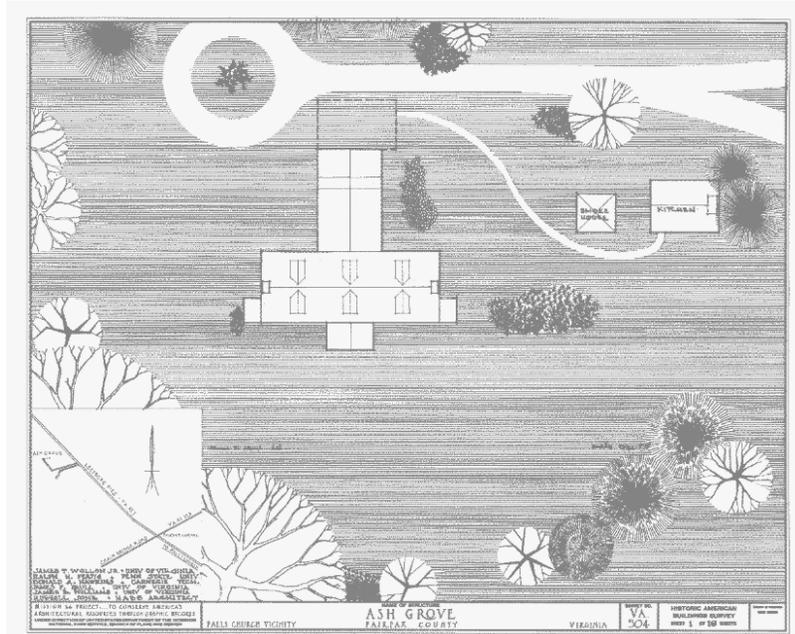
Ash Grove Site Plan, Historic American Building Survey, 1960. (Library of Congress).
